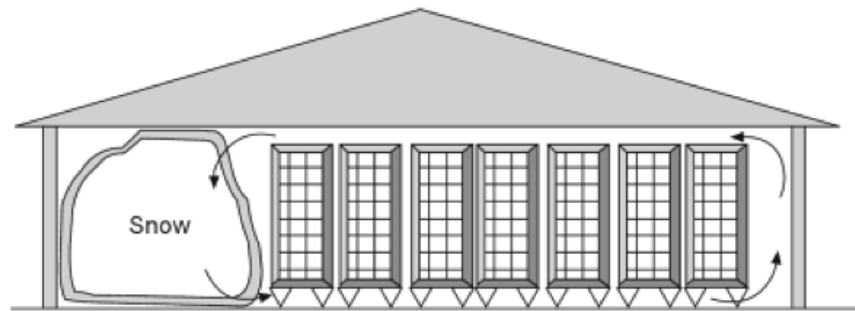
Section through a building, showing how snow and the cooled stuff are stored in the same space (Cabeza, 190).
